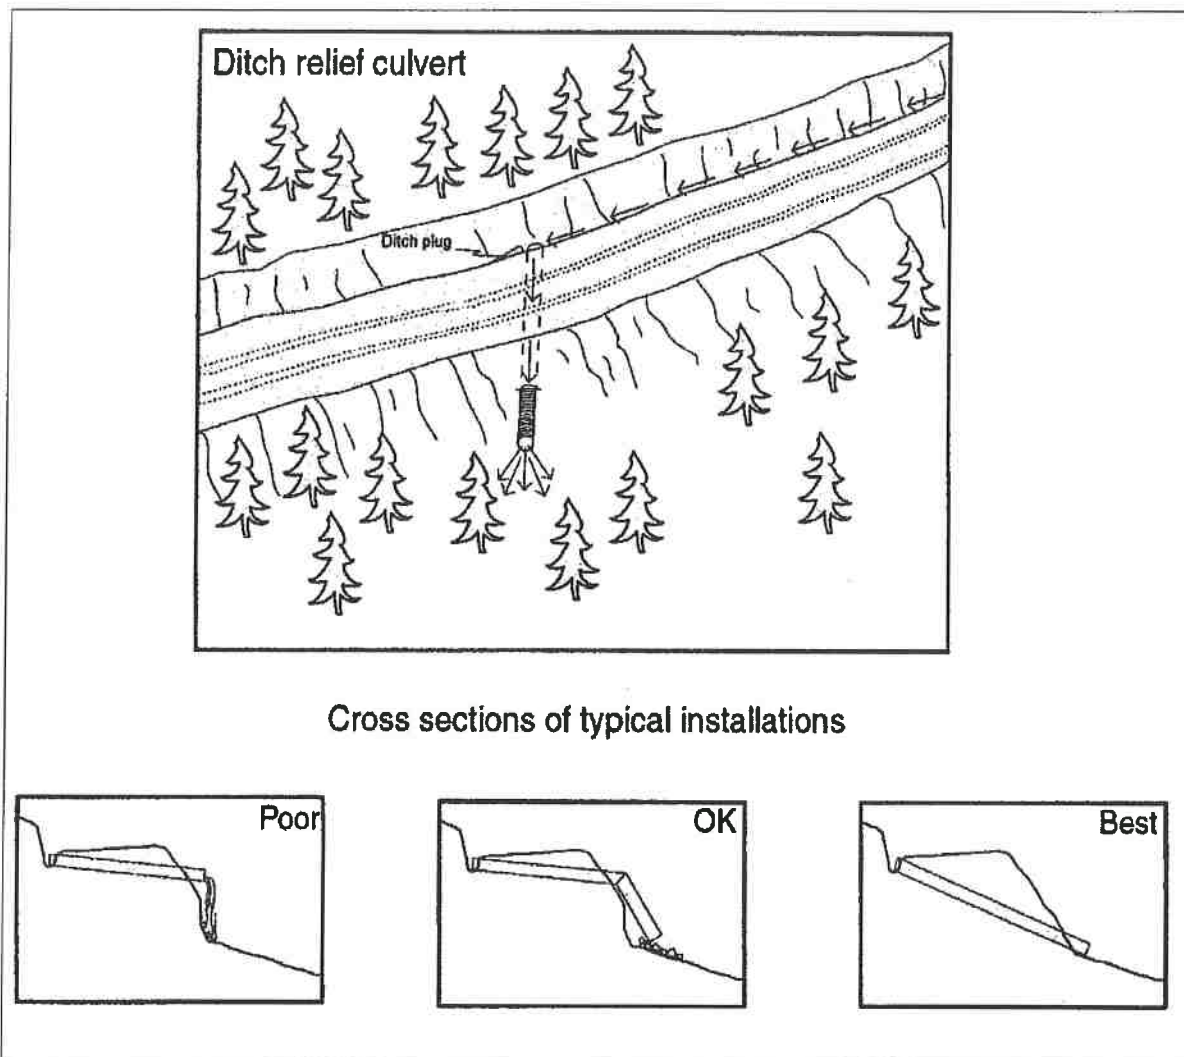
Typical ditch relief culvert installation. From CDFG (2002).
